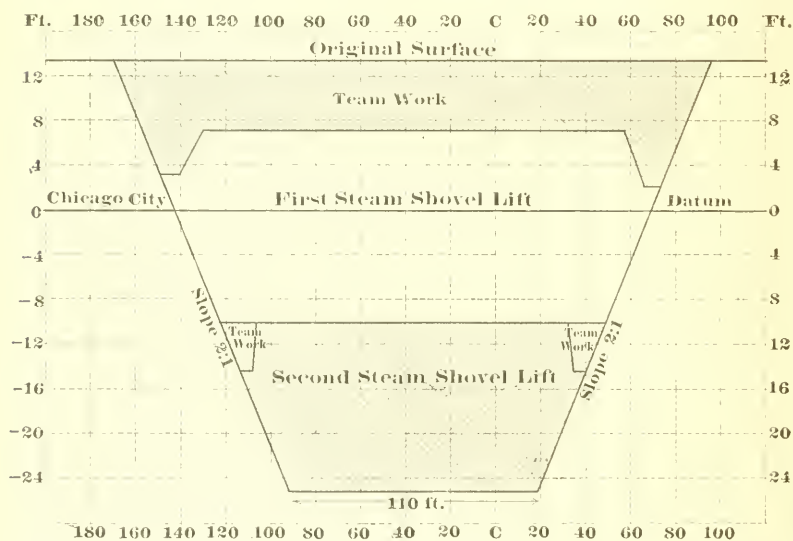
TYPICAL CROSS-SECTION SHOWING METHOD OF WORKING SECTIONS K AND I.
